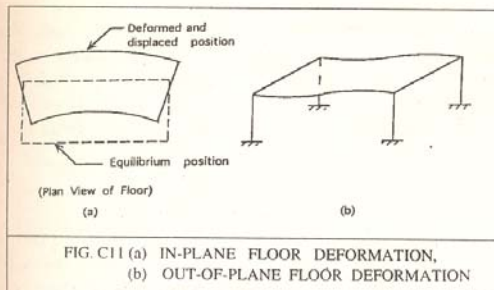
(a) IN-PLANE FLOOR DEFORMATION,
